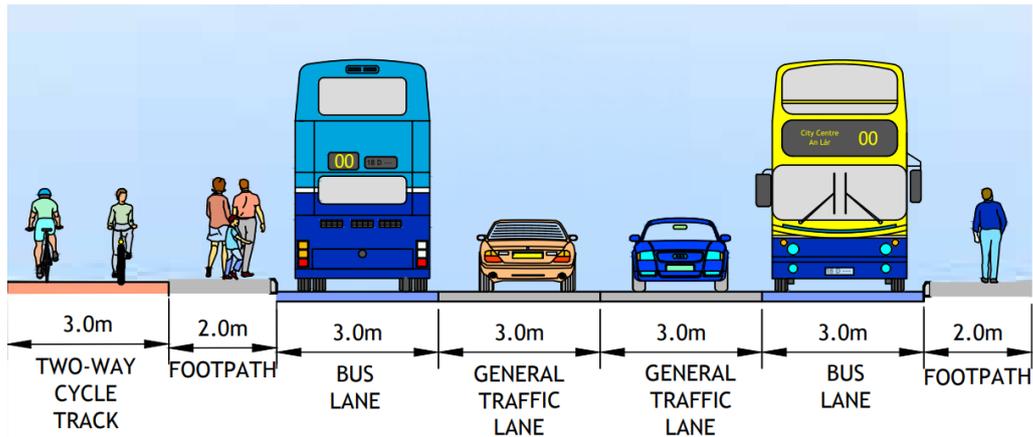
Cross-Section C-C (Relevant to RF1)
